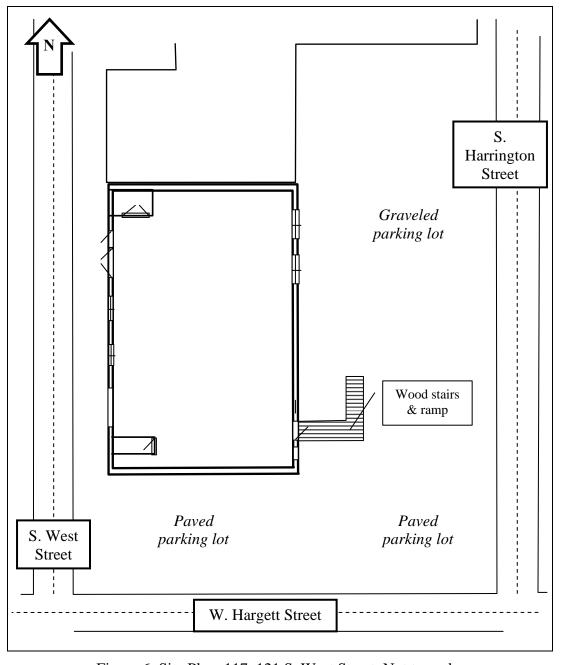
Site Plan, 117–121 S. West Street. Not to scale.
